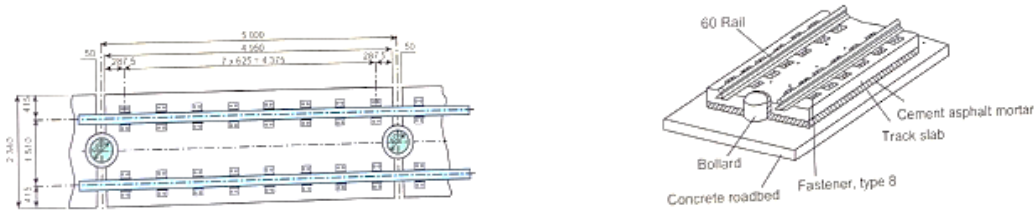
Cross and transversal section of concrete slab track. Esveld (2001)
